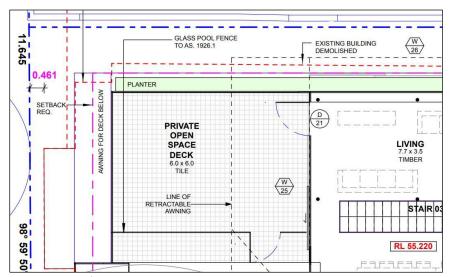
2<sup>nd</sup> floor private open space deck (Source: Burrow Architecture)
